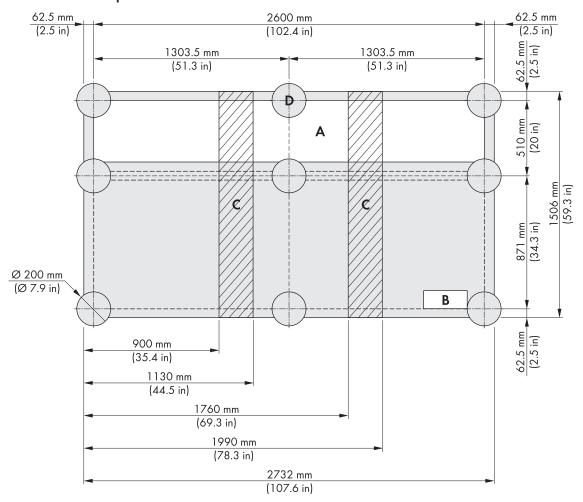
Arrangement of the pile-driven steel pillars and position of the openings in the floor area for introduction of the cables
